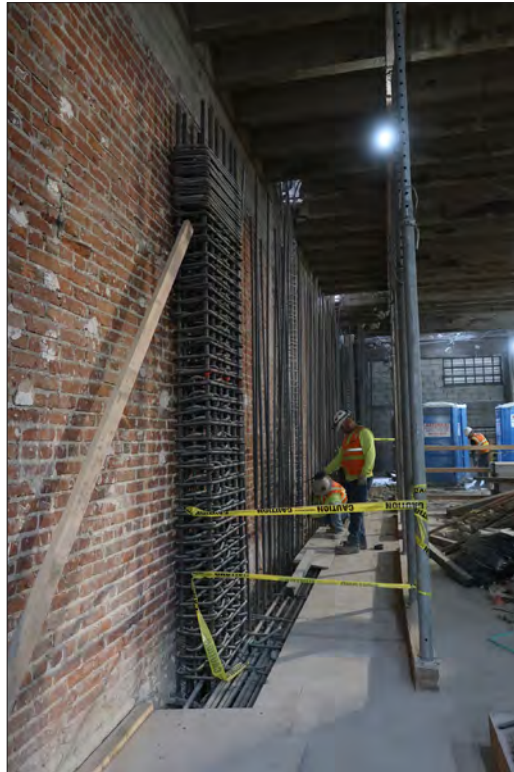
Subject property, floor 1, work on shear wall (Chattel, 2019)
